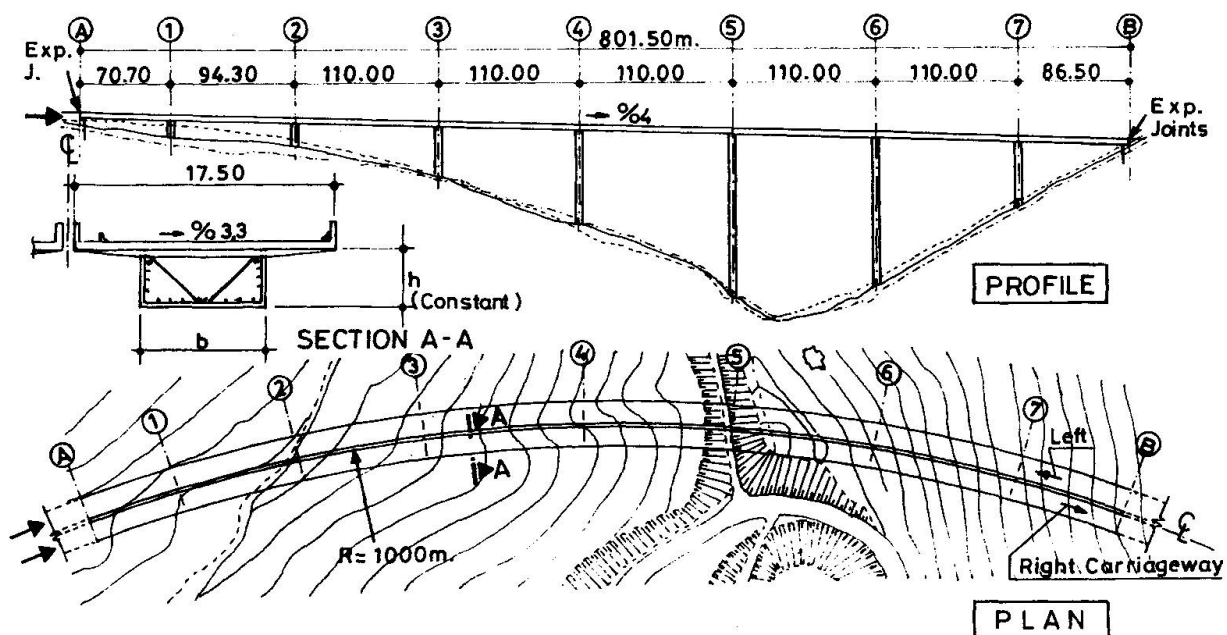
Plan, Profile and Typical Deck Section of the Viaduct.
